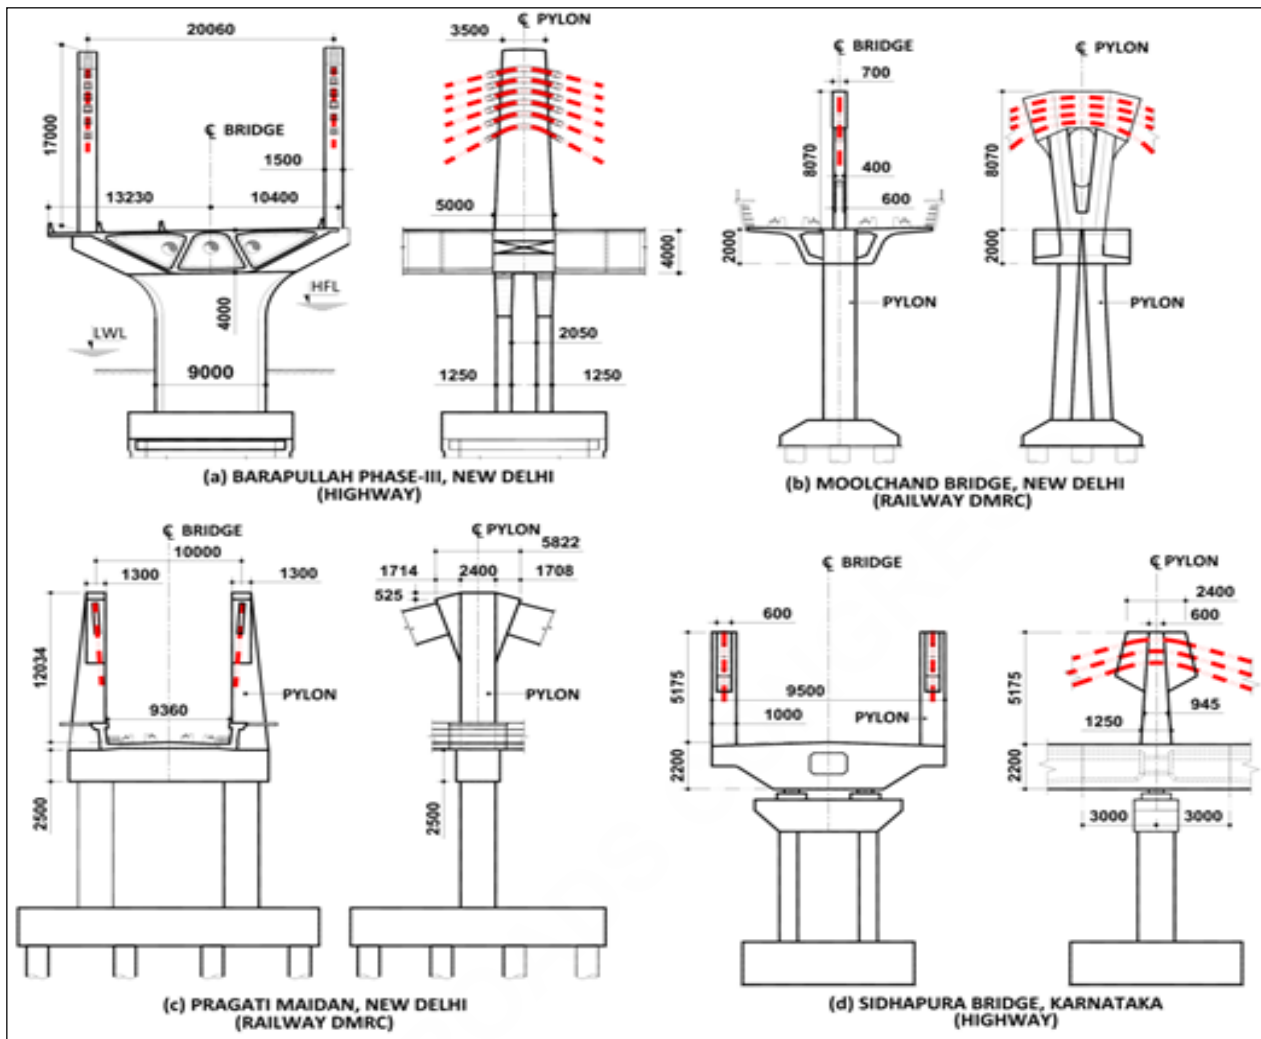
Typical Pylon Configurations for Extradosed Bridges
